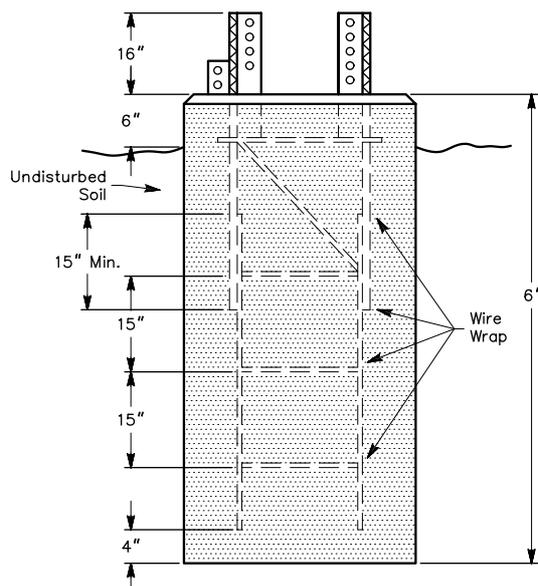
Plans for installing concrete base for Wilson ST-77B tower. Although the instructions and dimensions vary from tower to tower, this is representative of the type of concrete base specified by most manufacturers.
